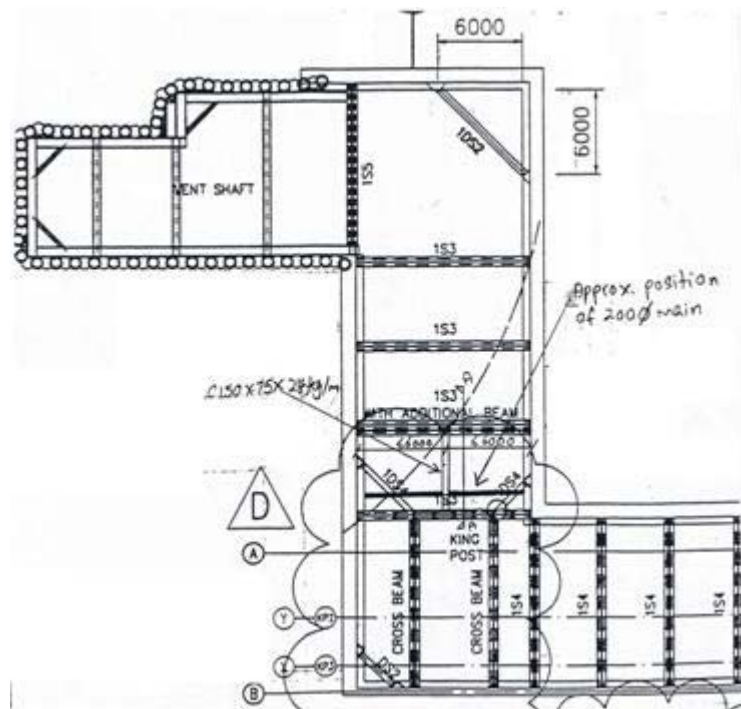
Corner struts, struts/KP supporting water main and manhole.
